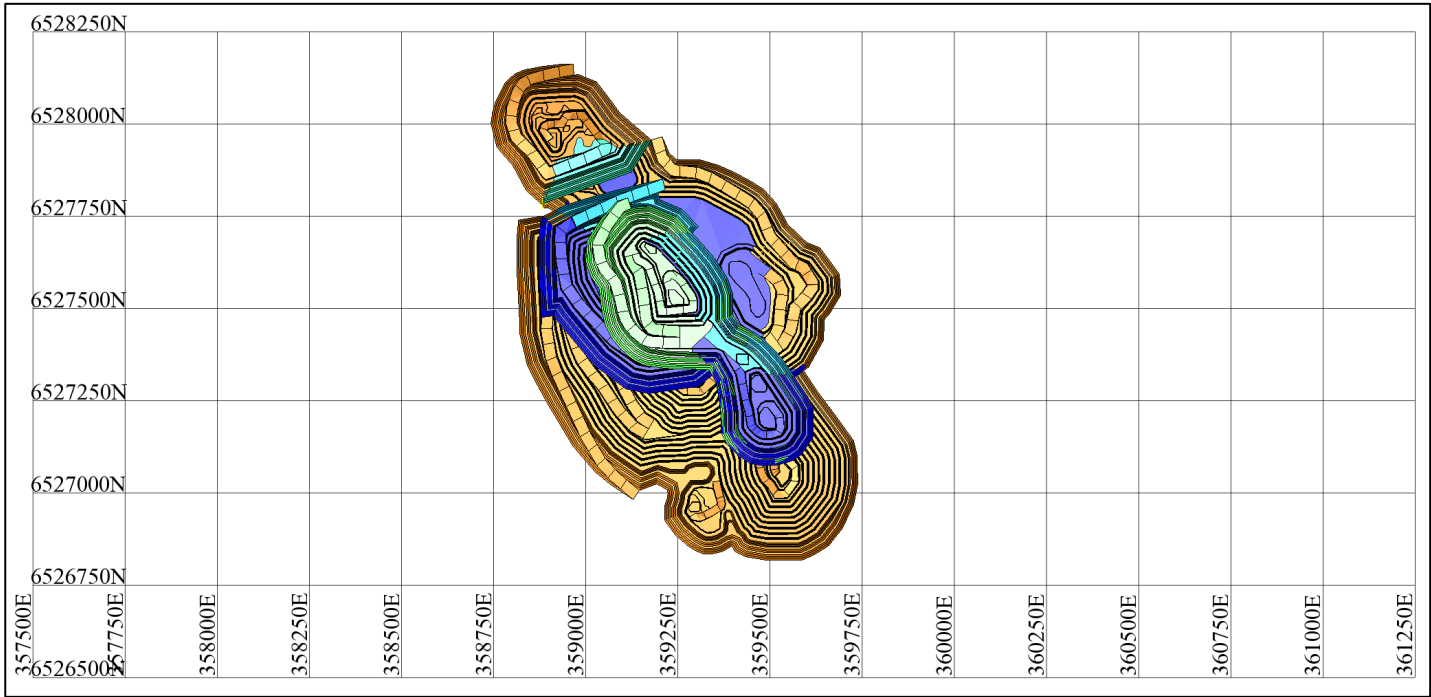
Theia All Pit Stages – Plan view – Production Case
